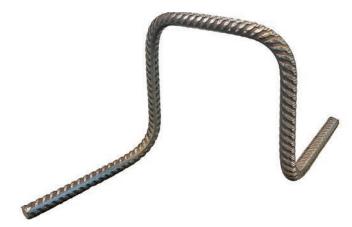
Hurdles used to support top reinforcement for wind turbine foundation
